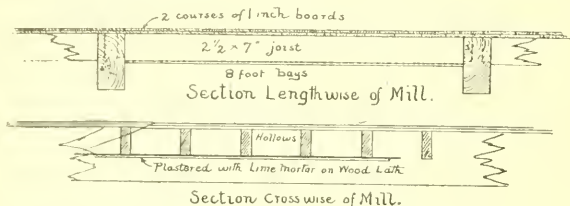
SKETCH OF OLD HOLLOW MILL FLOOR.
